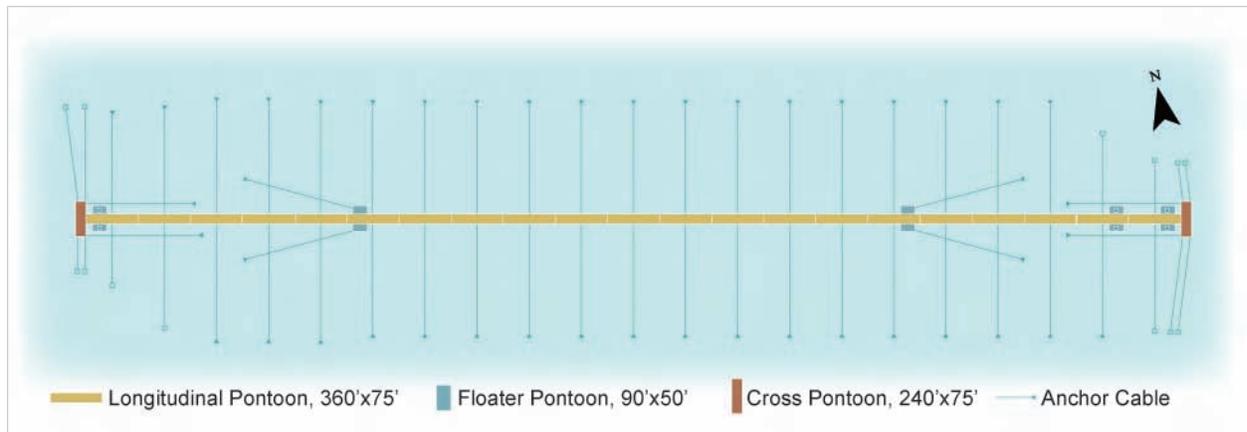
Pontoon Configuration for Catastrophic Failure Bridge Replacement
